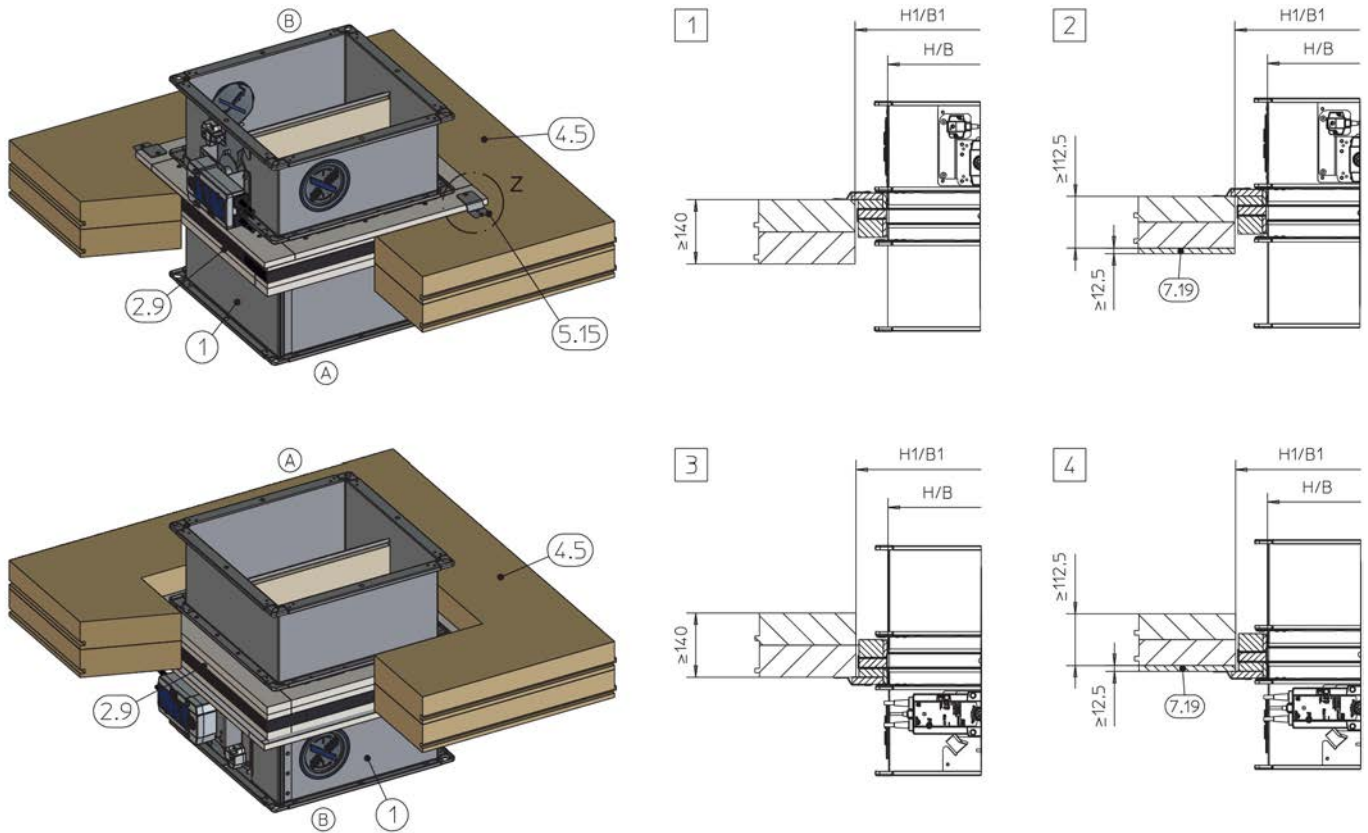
Mortar-based installation into a solid wood ceiling, suspended or upright
